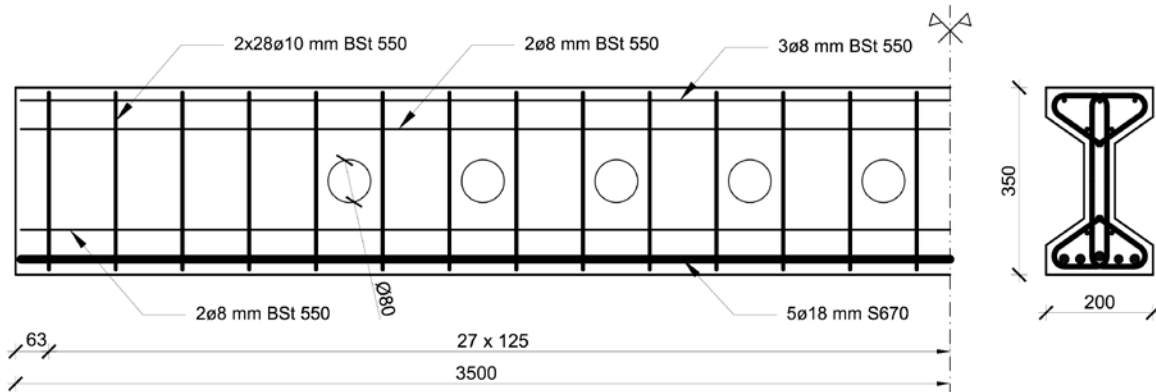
Reinforcement layout of the UHPFRC beams with I-shaped cross section
